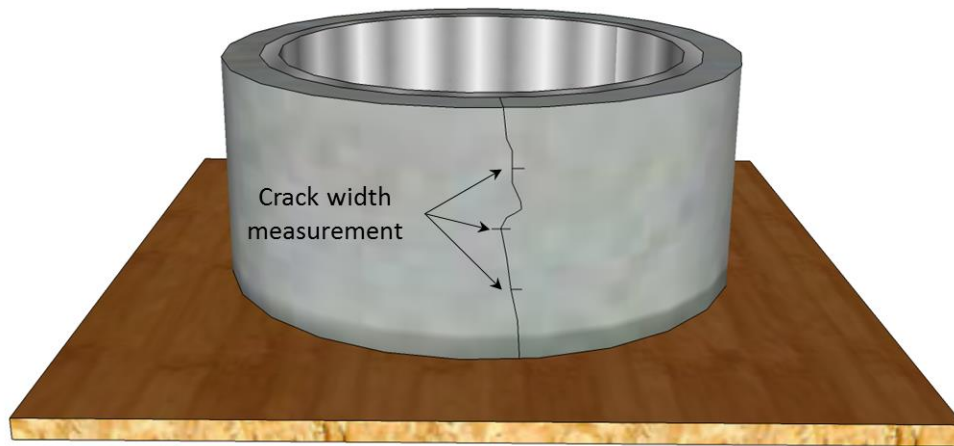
Test setup for crack width measurement of restrained shrinkage test
